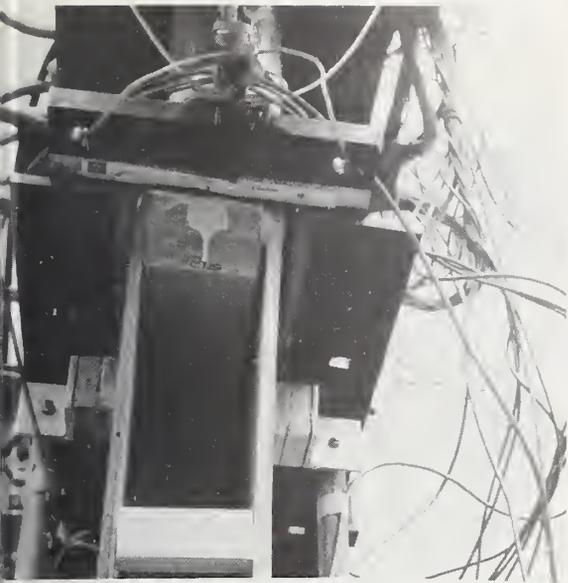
Test run No. 21 (WFTH, face bearing).
